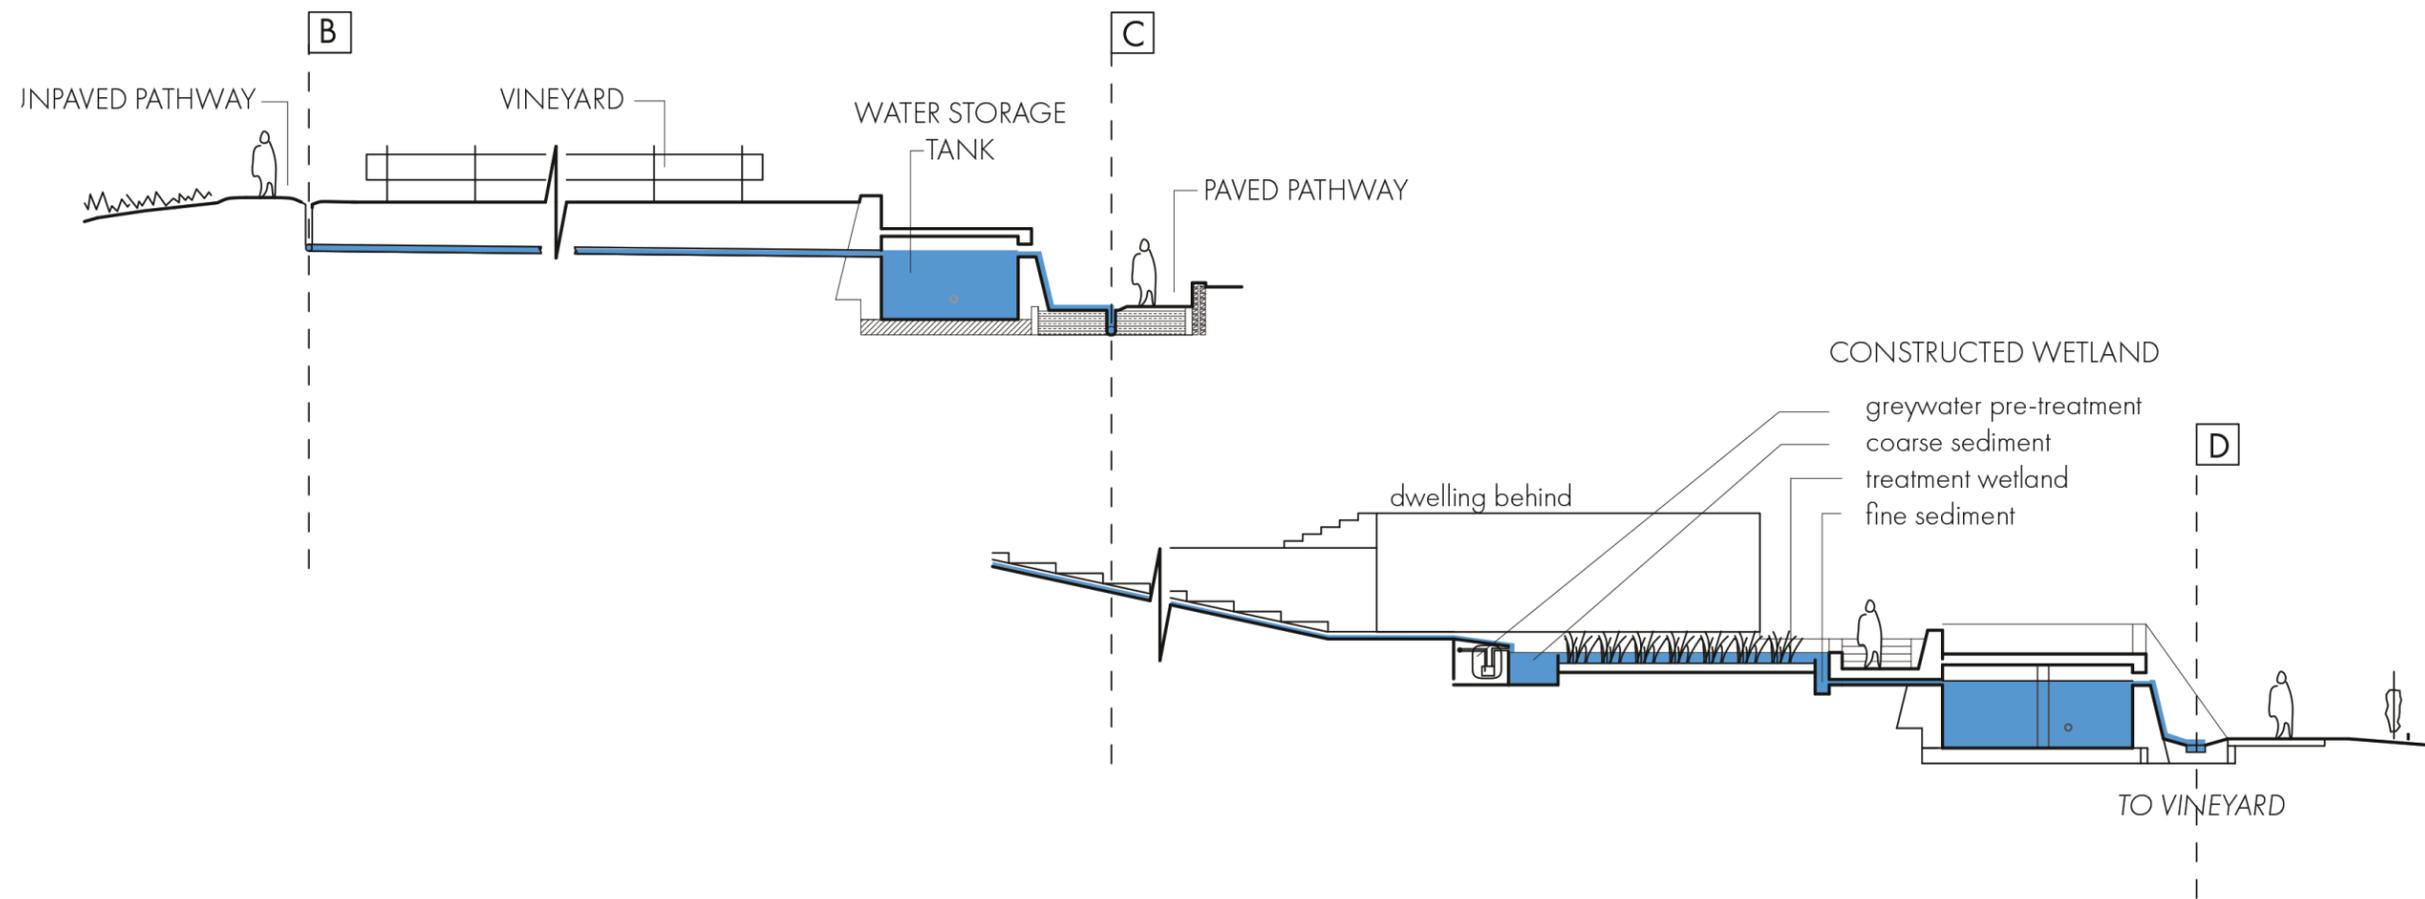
1:100 WATERCOURSE SECTION DETAIL 02
